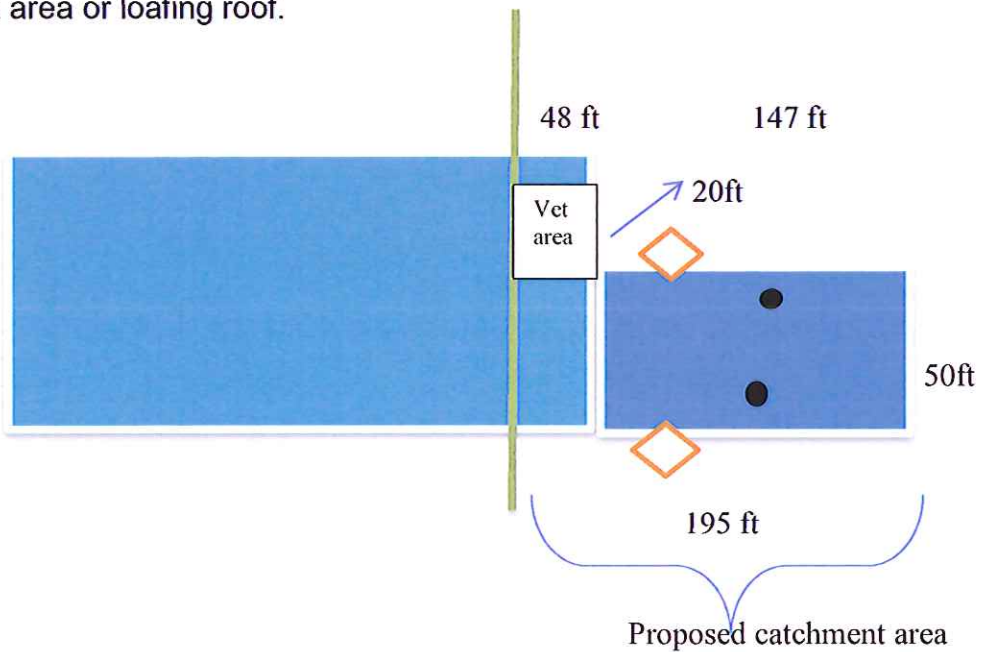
Diagram of the new Dairy floor plan. Collecting water from the parlor, vet area or loafing roof.
